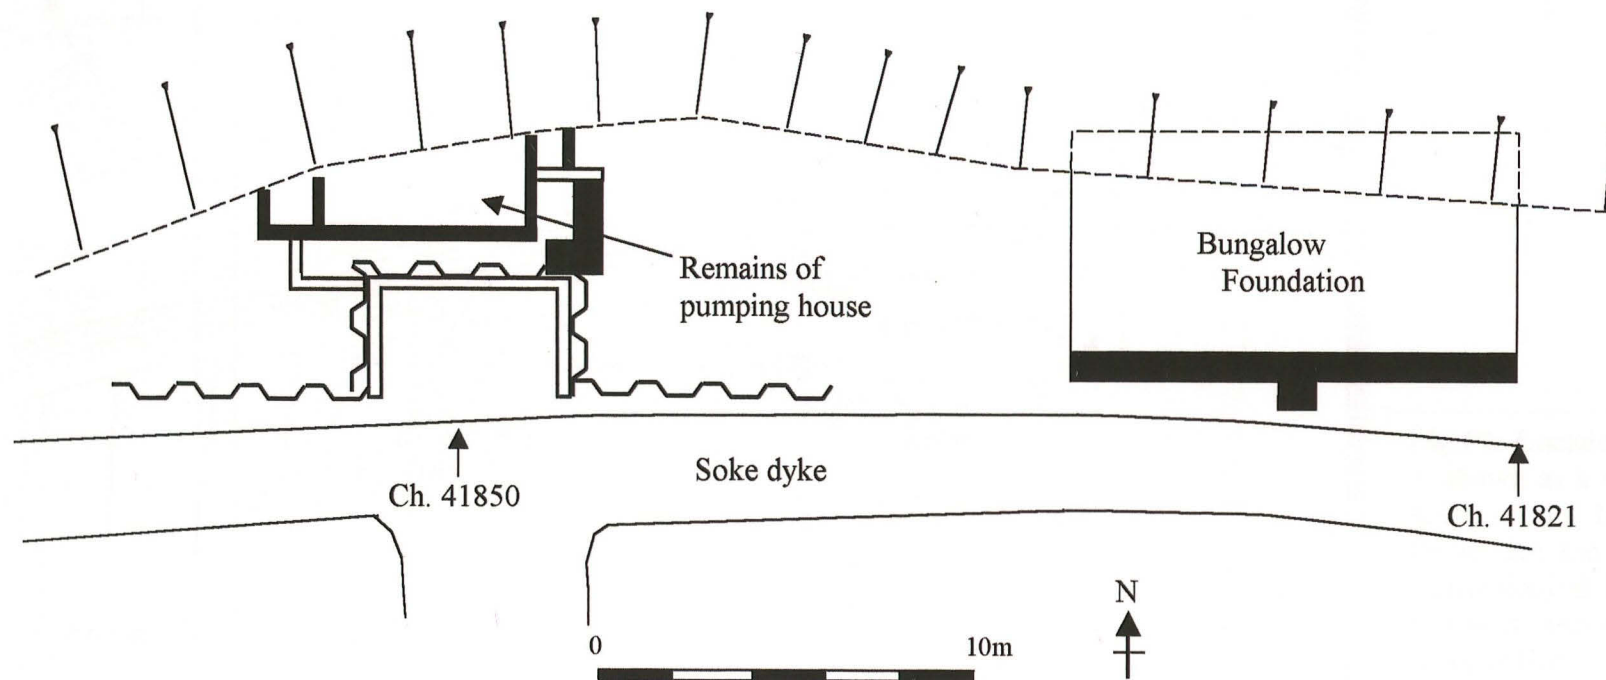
Plan of the remains of the pumping station and bungalow at ch 41850.
